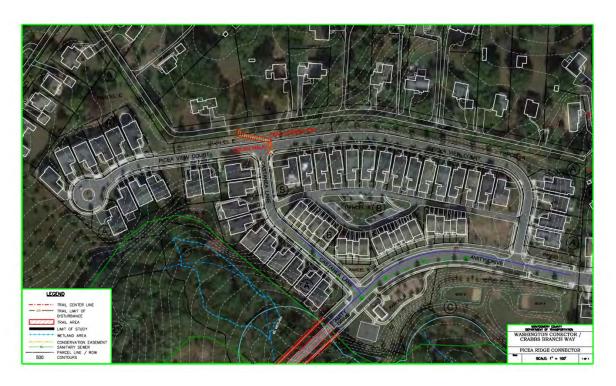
Washington Grove Connector – Alternative #4 (Picea View Court)
